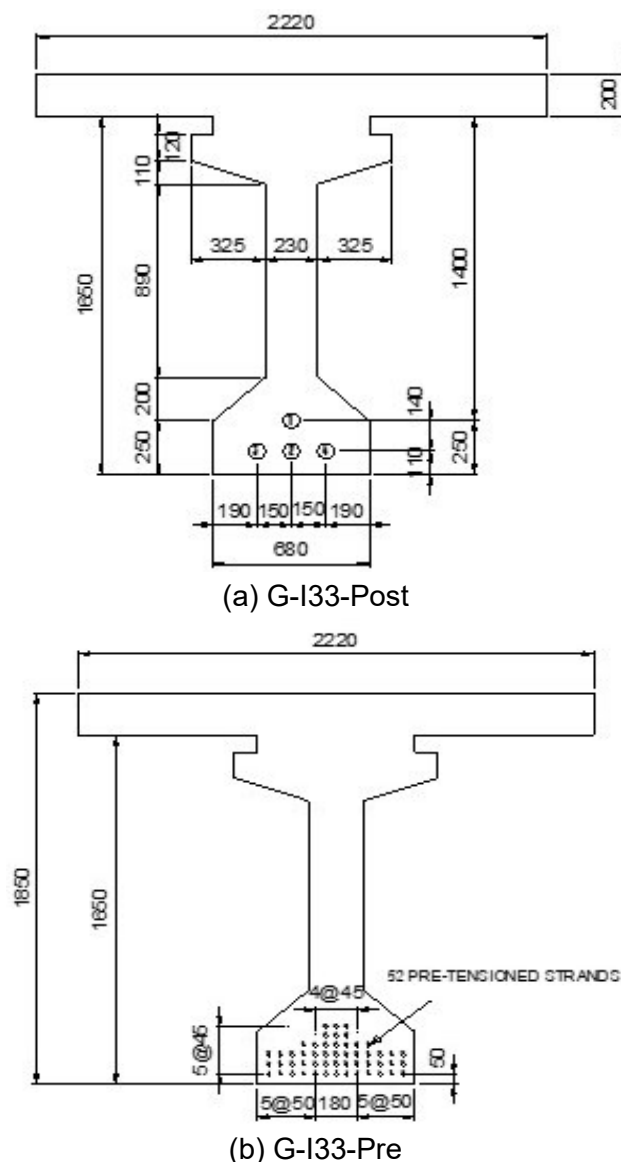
Cross section of investigated girders (after the deck slab is cast)
